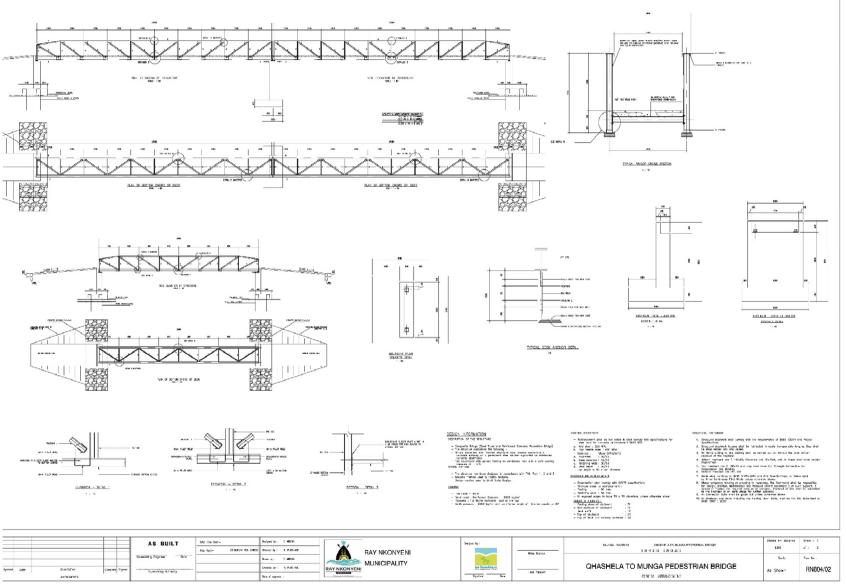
Mqhashela to Munga Pedestrian Bridges – General Arrangement - Structural Details – RN804/02
